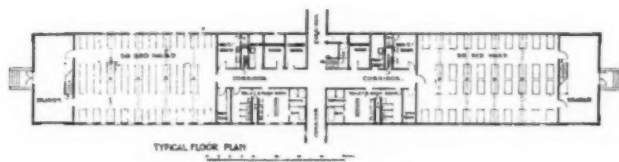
Typical floor plan of the Military Hospital at Ste. Anne de Bellevue, P. Q., Canada.
